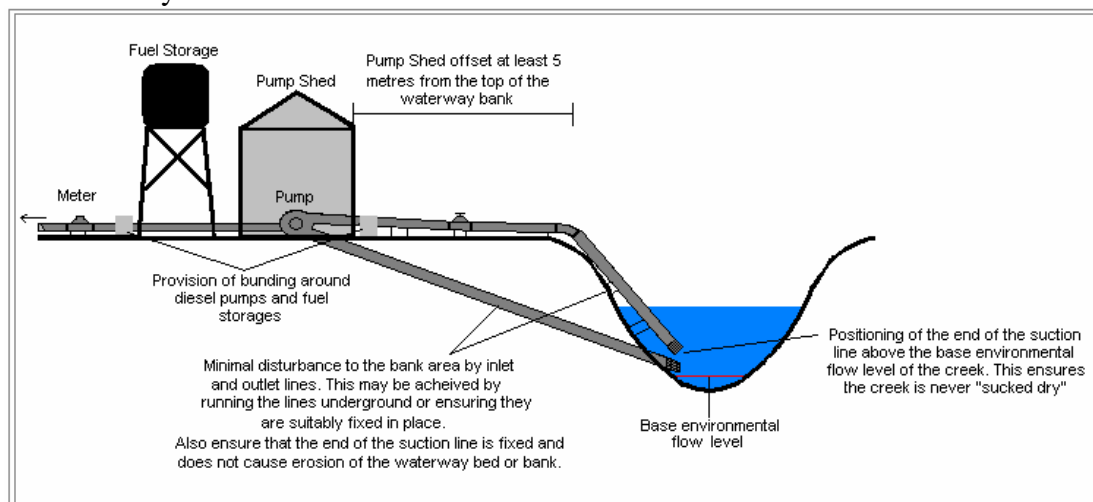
Cross section of the “right” way a waterway off-take should be installed
